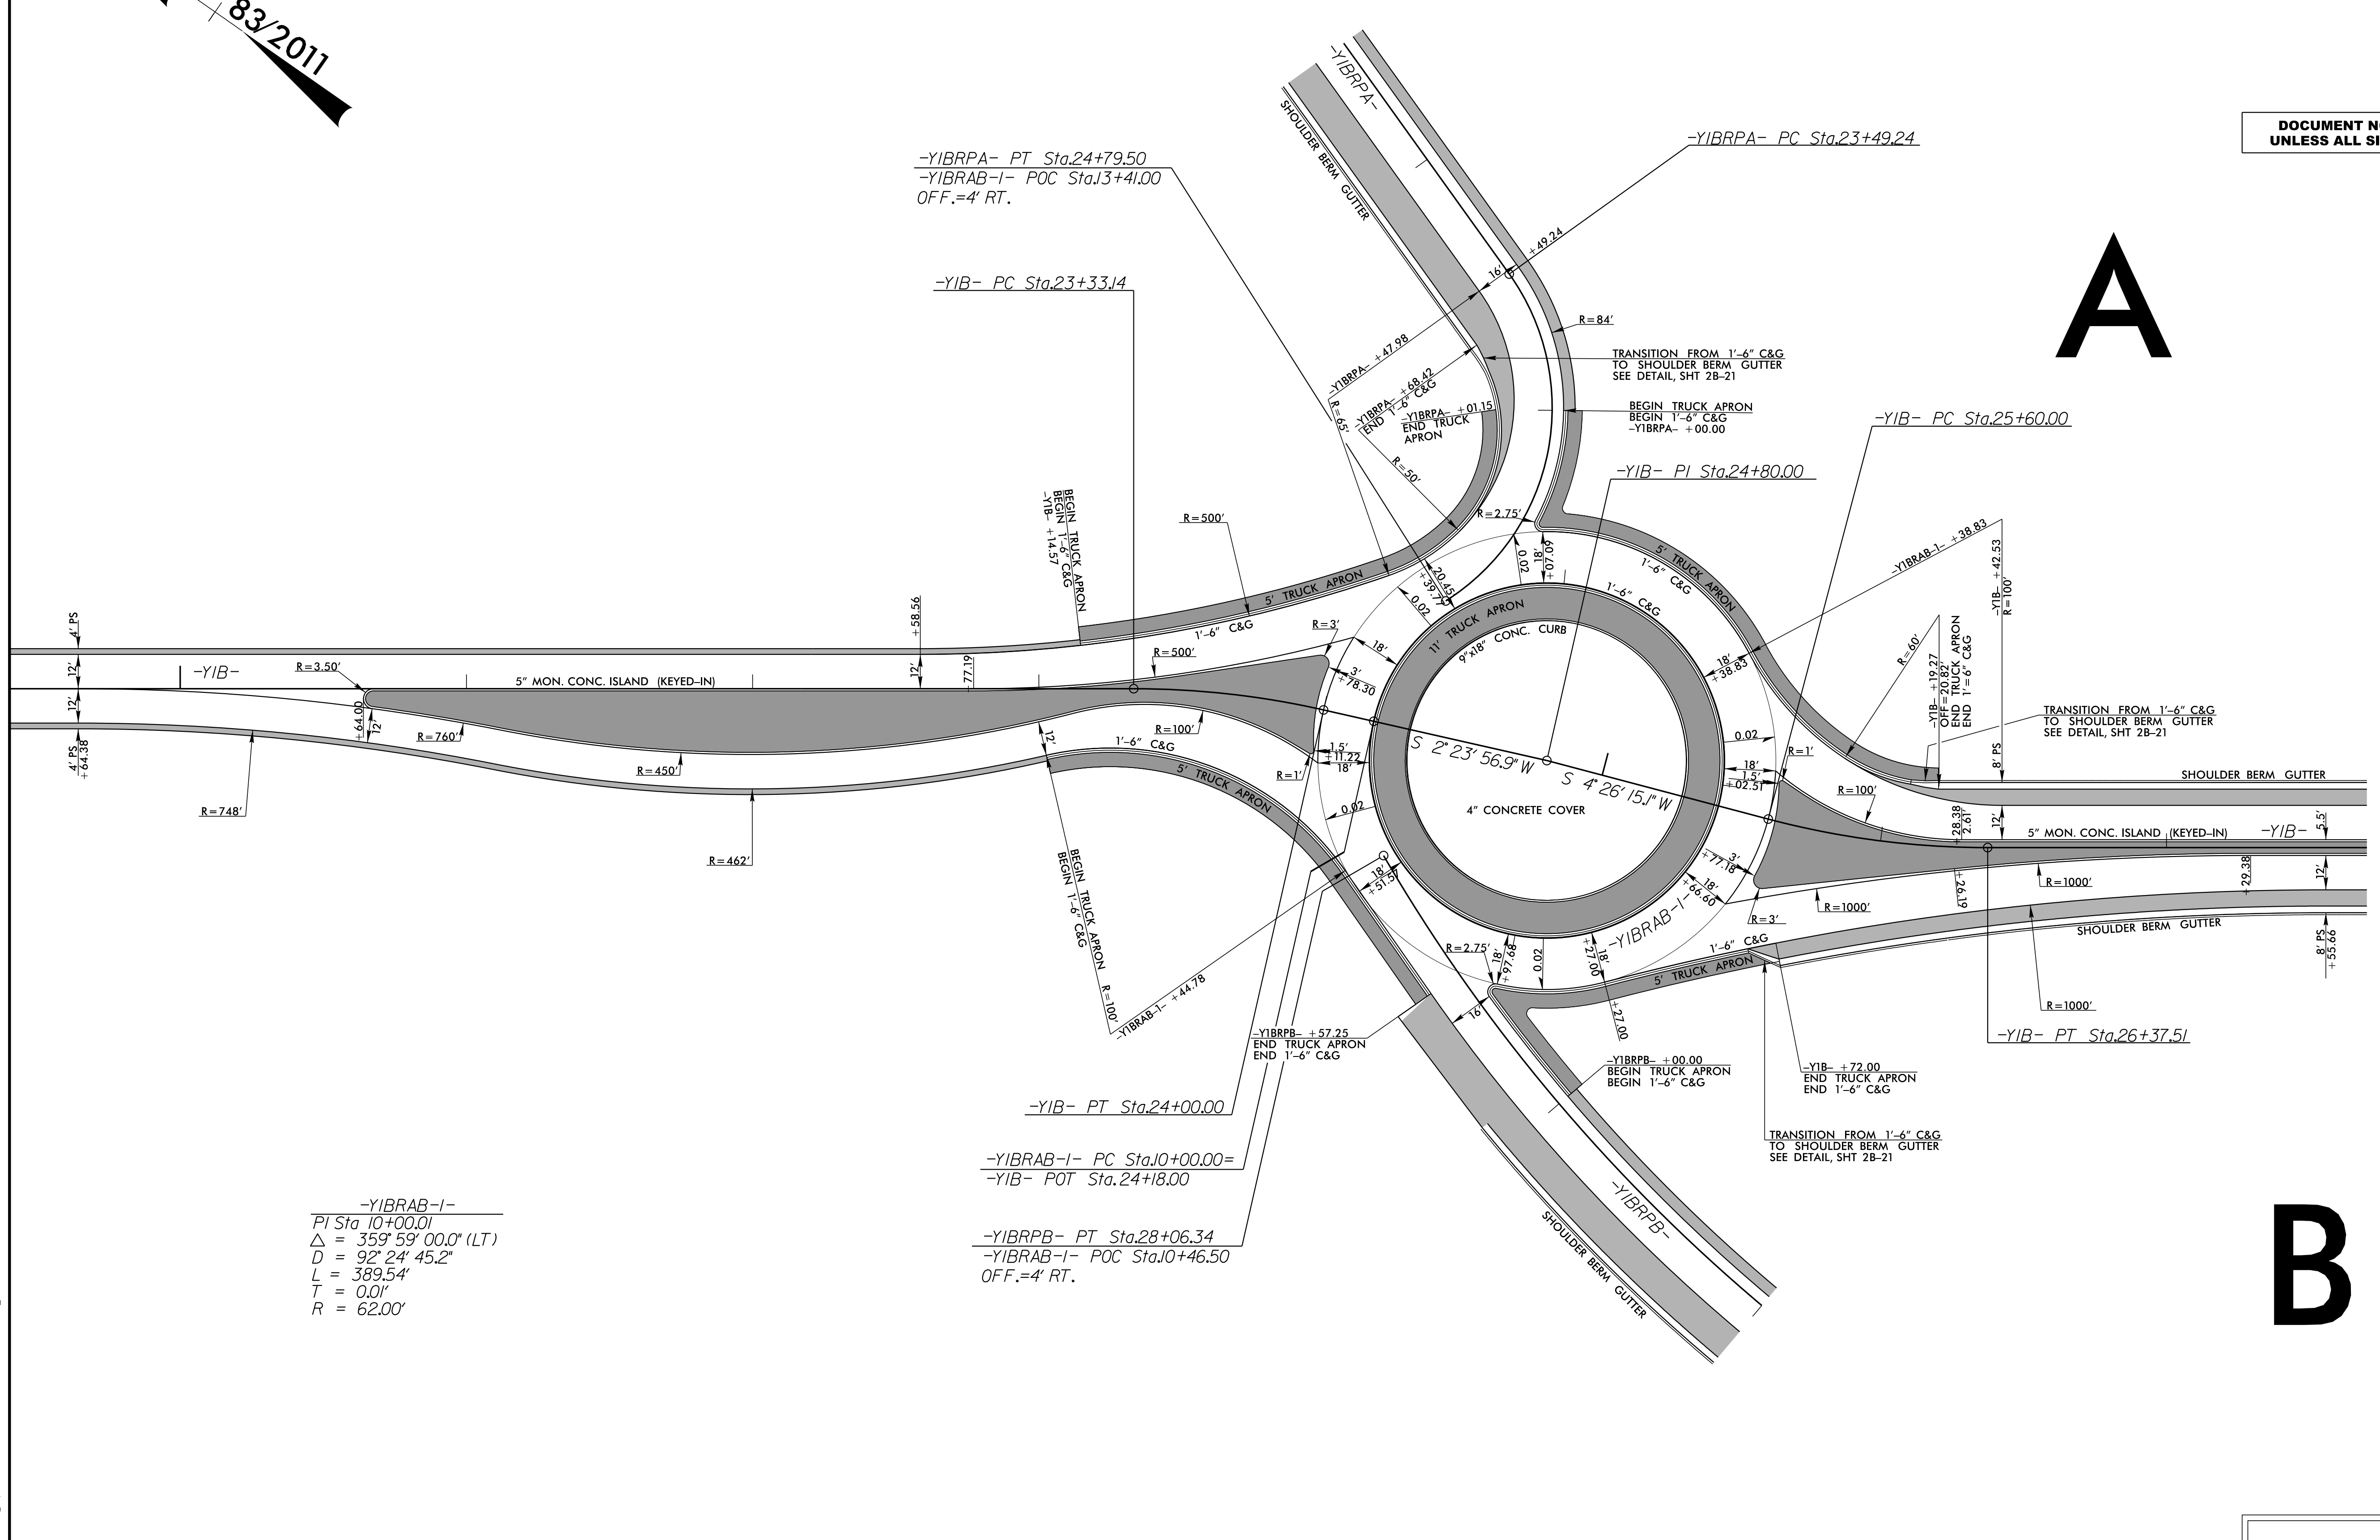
DETAIL SHOWING ROUNDABOUT (-YIBRAB-1)
